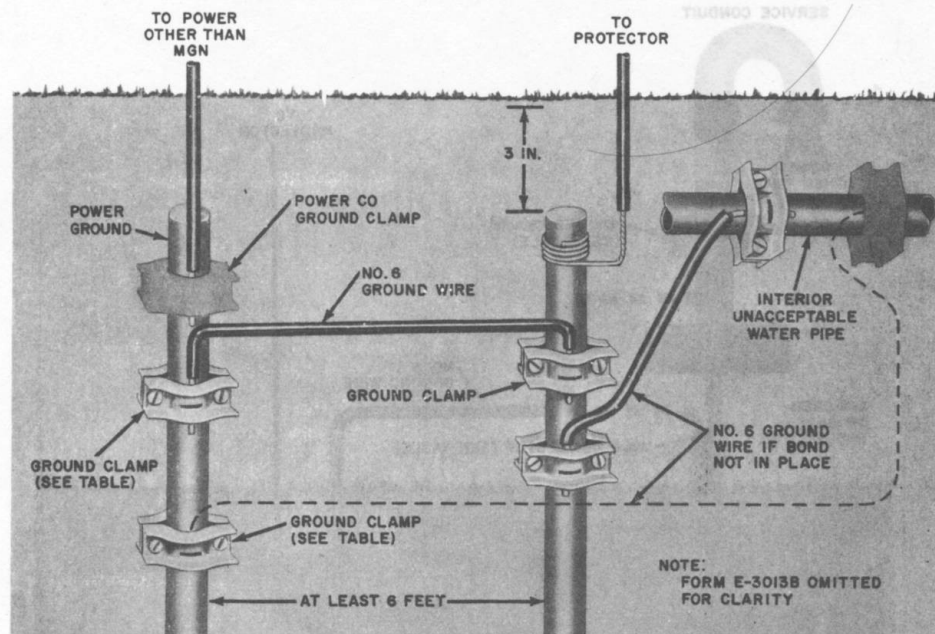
Power Other Than MGN Grounded to Ground Rod—Unacceptable Interior Water System
